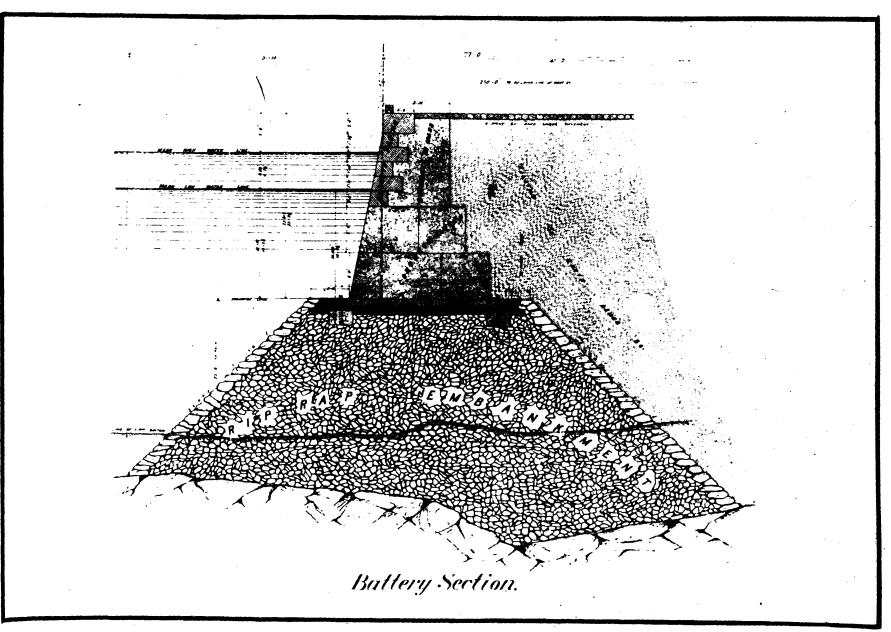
Concrete block wall on riprap, as built at the Battery.
